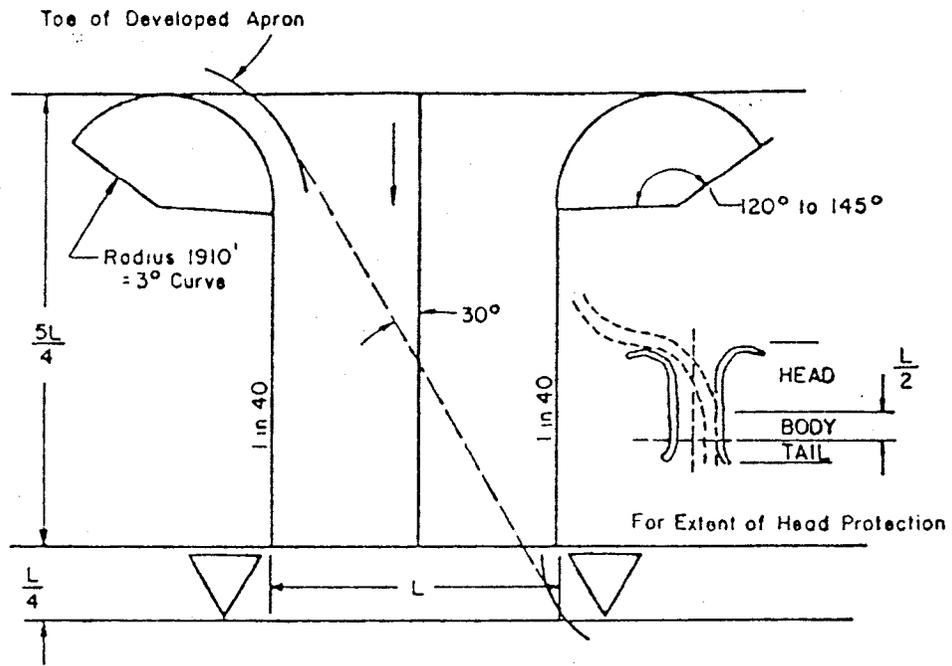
Straight Guide Bank Design to Protect Bridge From Misalignment of the Flow.
